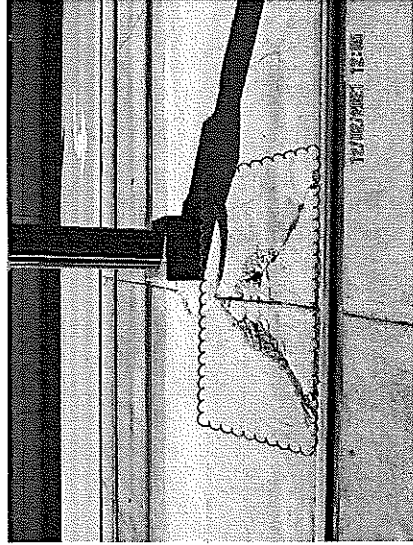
CEDAR ST. BRIDGE OVER I-35E
